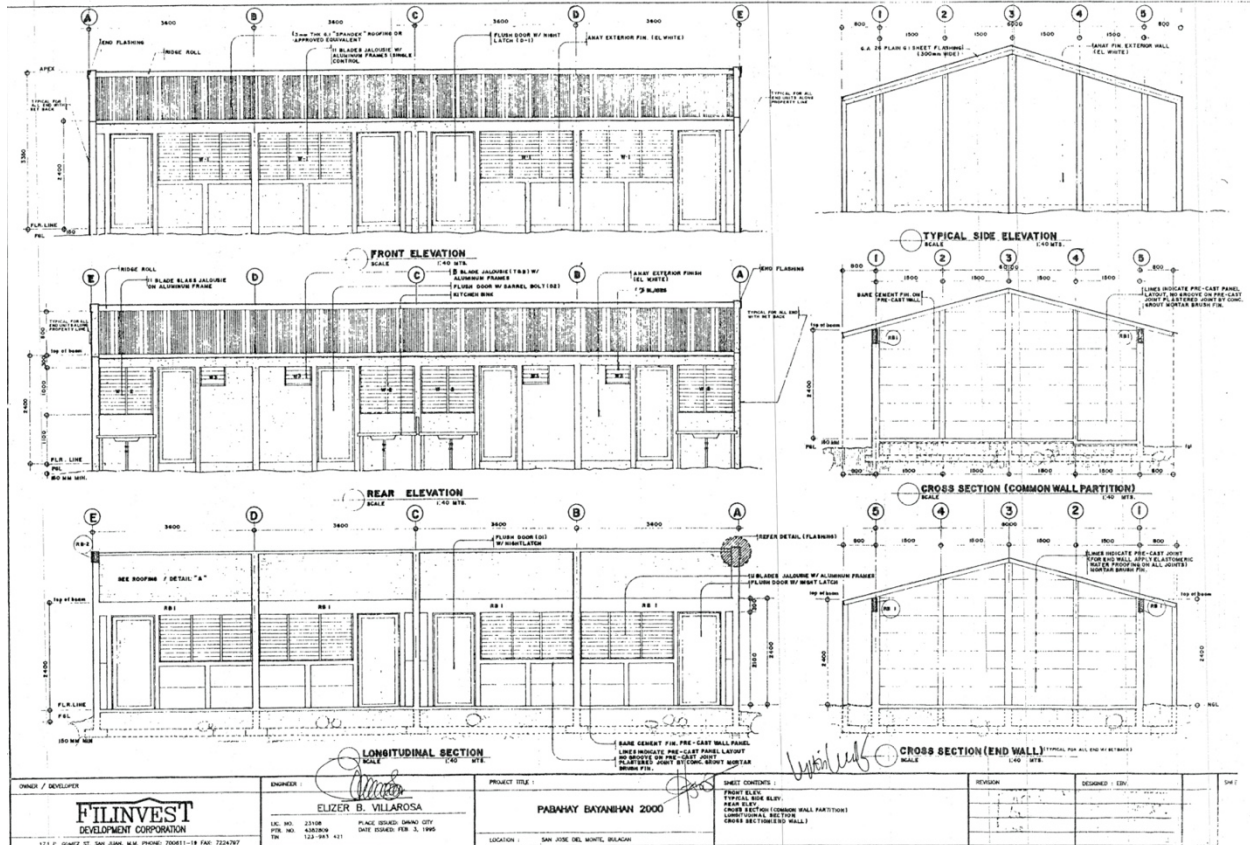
The elevation and sections for the typical housing structures. (Source: Filinvest Development Corporation, 1995 courtesy of the NHA)
